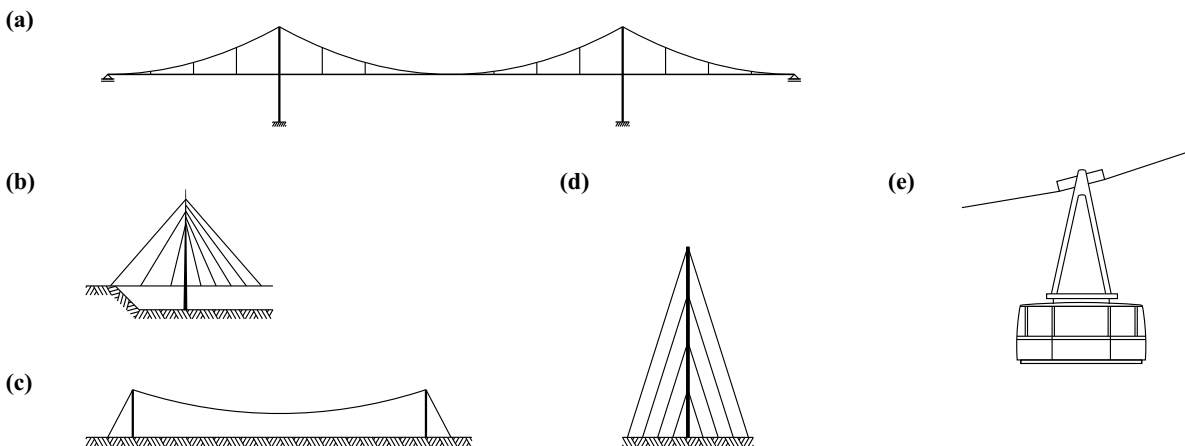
Typical applications for cables: (a) suspension bridge, (b) cable-stayed bridge, (c) suspended roof, (d) guyed tower, (e) aerial ropeway
